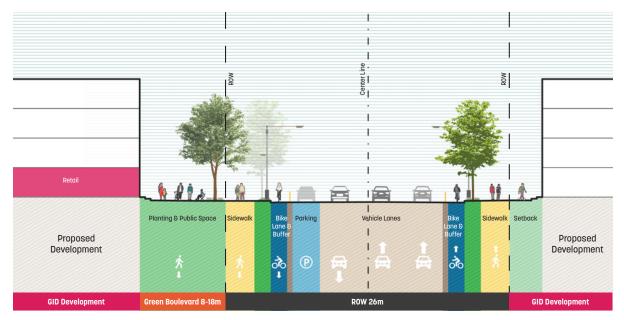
Typical collector road cross section (Sasaki, April 10, 2024)
